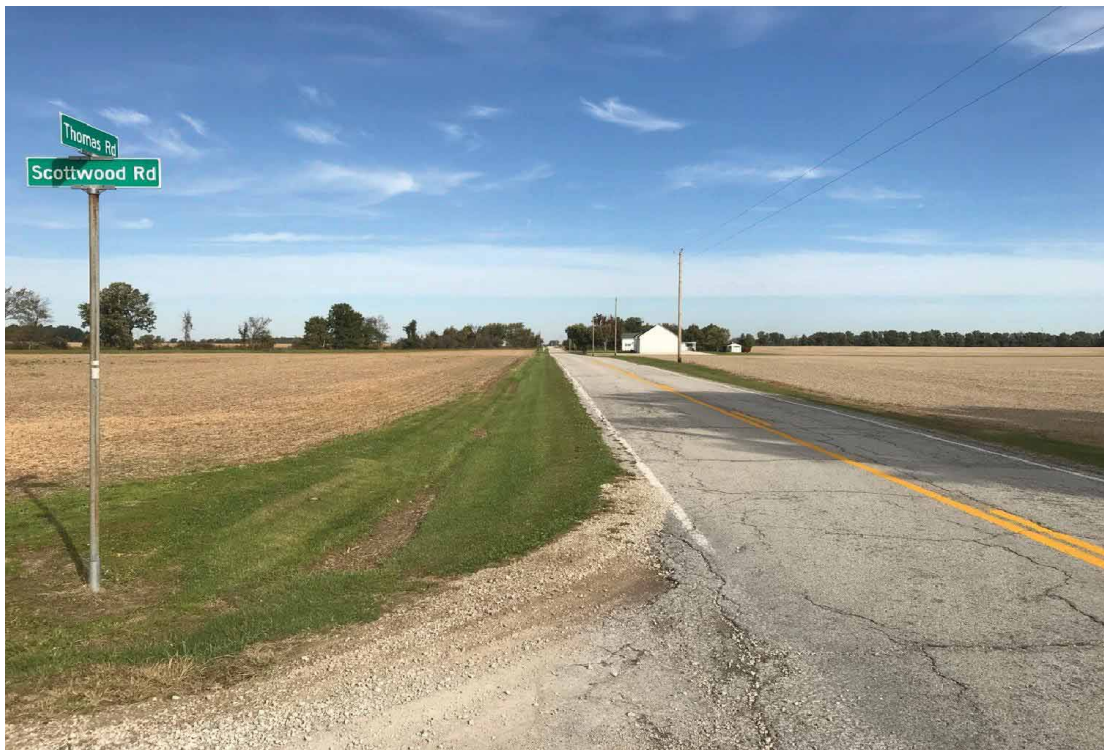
Looking north from Scottwood Road and Thomas Road.
